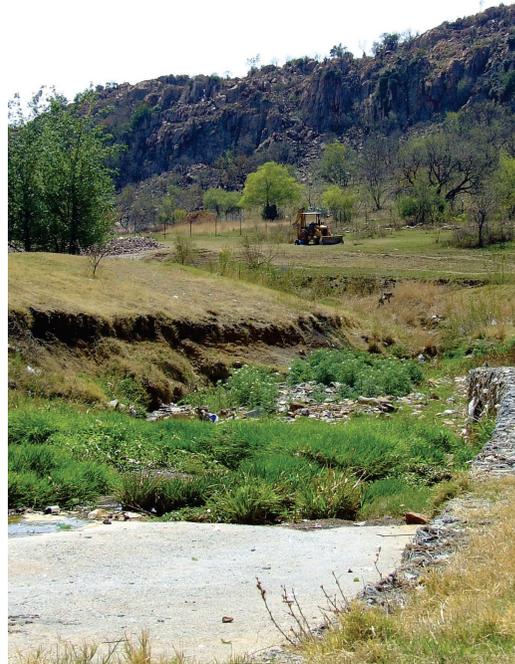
Stormwater drain in Moretele Park stabilised with gabion walls
